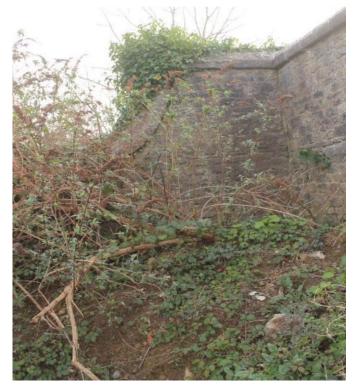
West facing shot of the point at which the enclosure wall adjoins the main Dockyard boundary wall.
